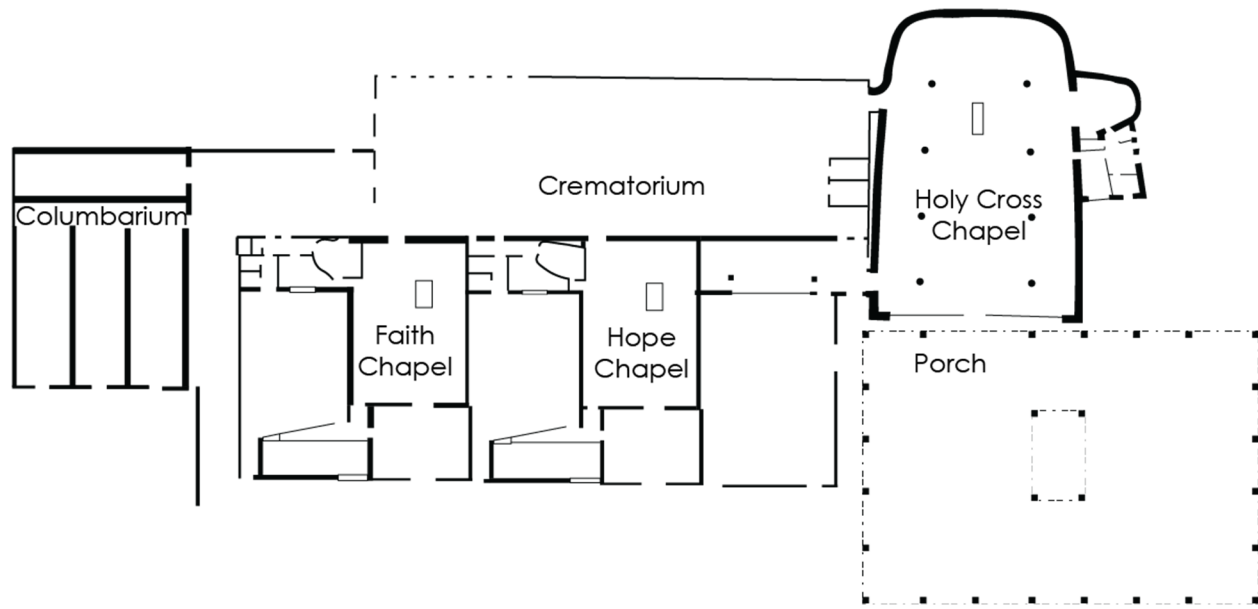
Skogskyrkogården Crematorium Plan (Source: Author)
